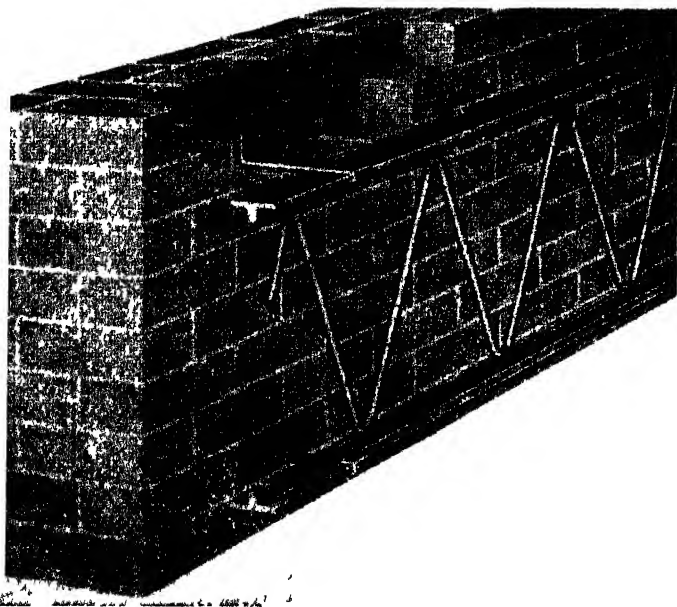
Showing typical open truss steel joist installed on masonry wall. Steel joists parallel to masonry walls should have their top and bottom chords anchored to the wall by means of special wall anchors where each row of bridging occurs. The bent end of each anchor should be first attached to the joist and the other end bent up and built into the masonry wall as illustrated.
